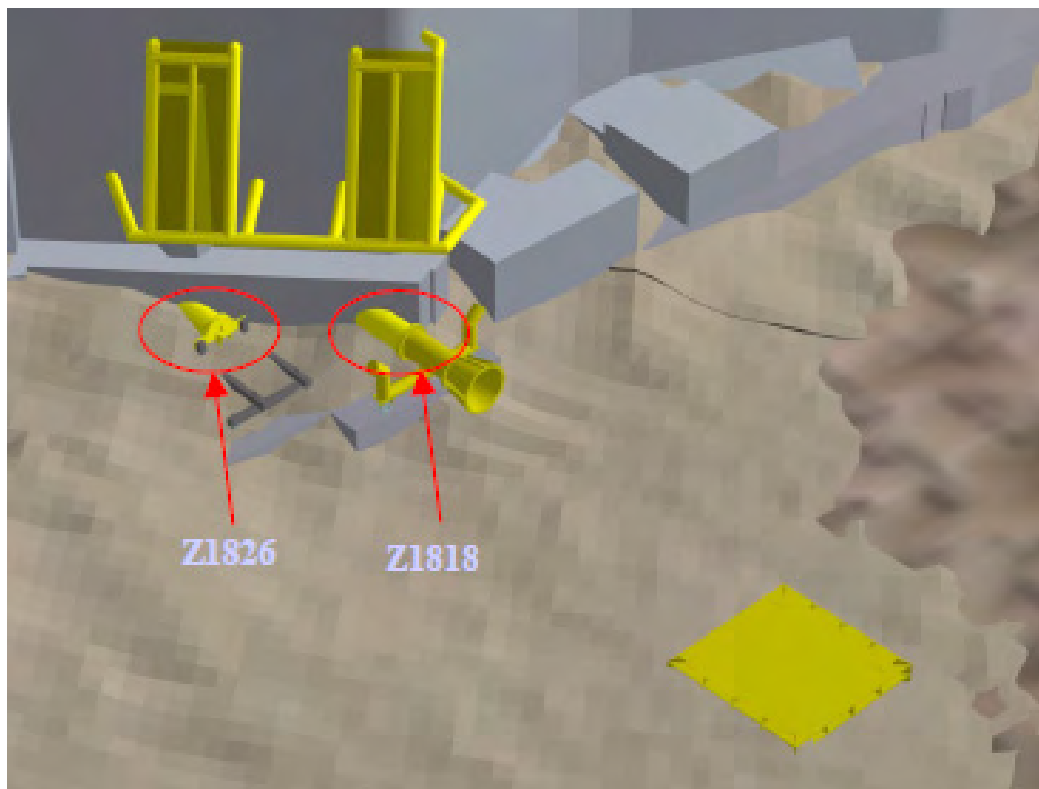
Material Relocation for J-Tube Bridge Structure
